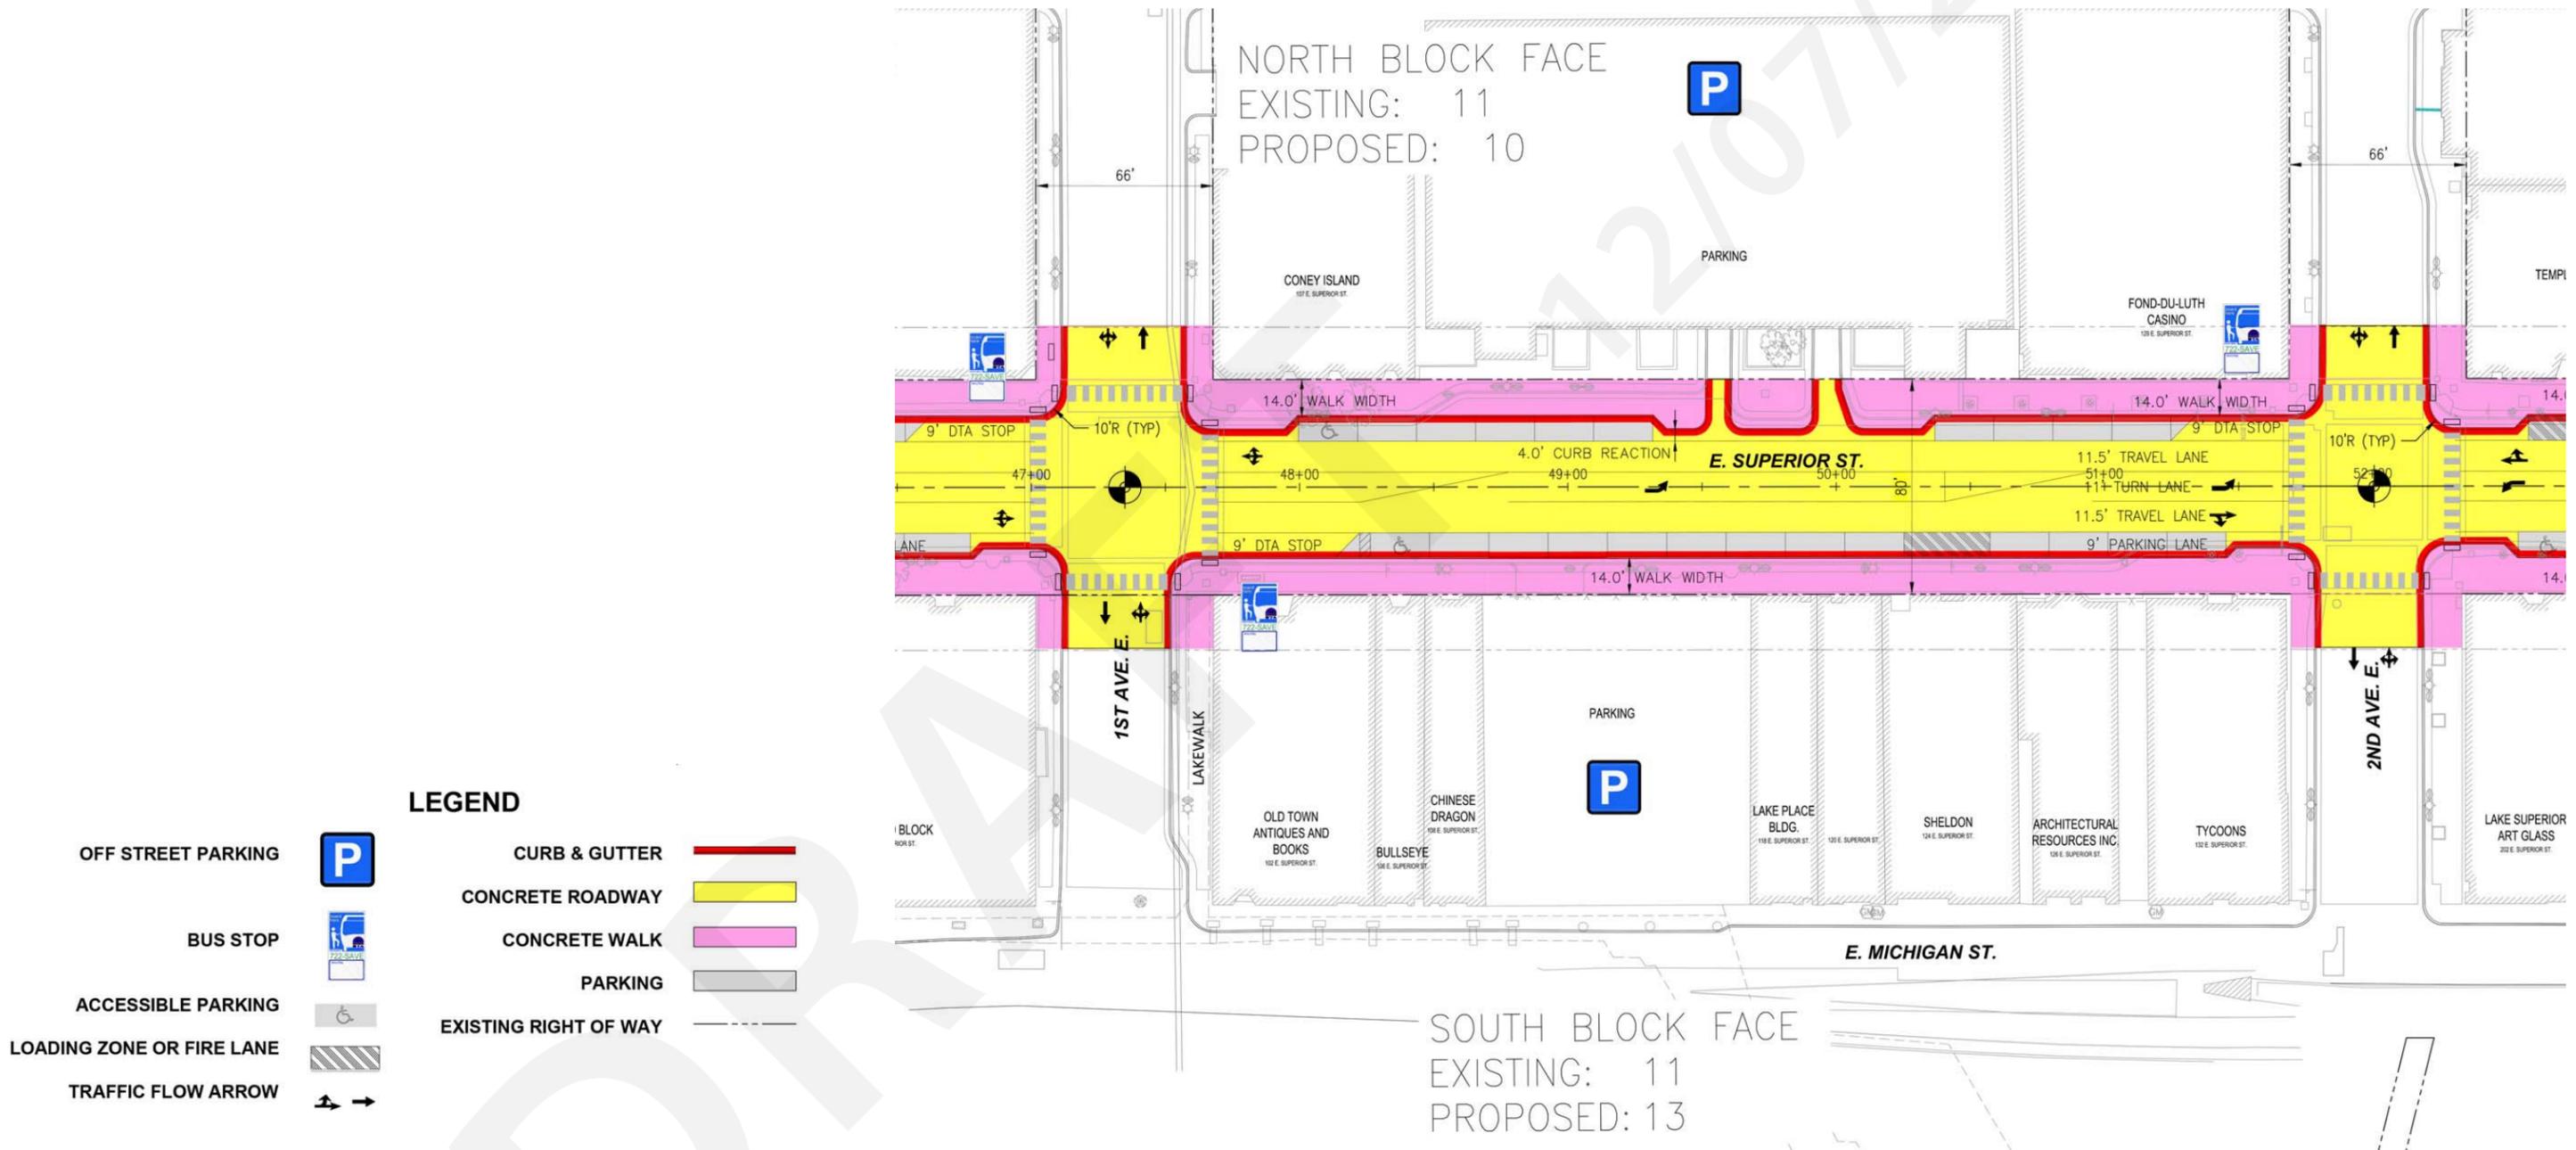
Proposed street layout between 1st Avenue East and 2nd Avenue East.
